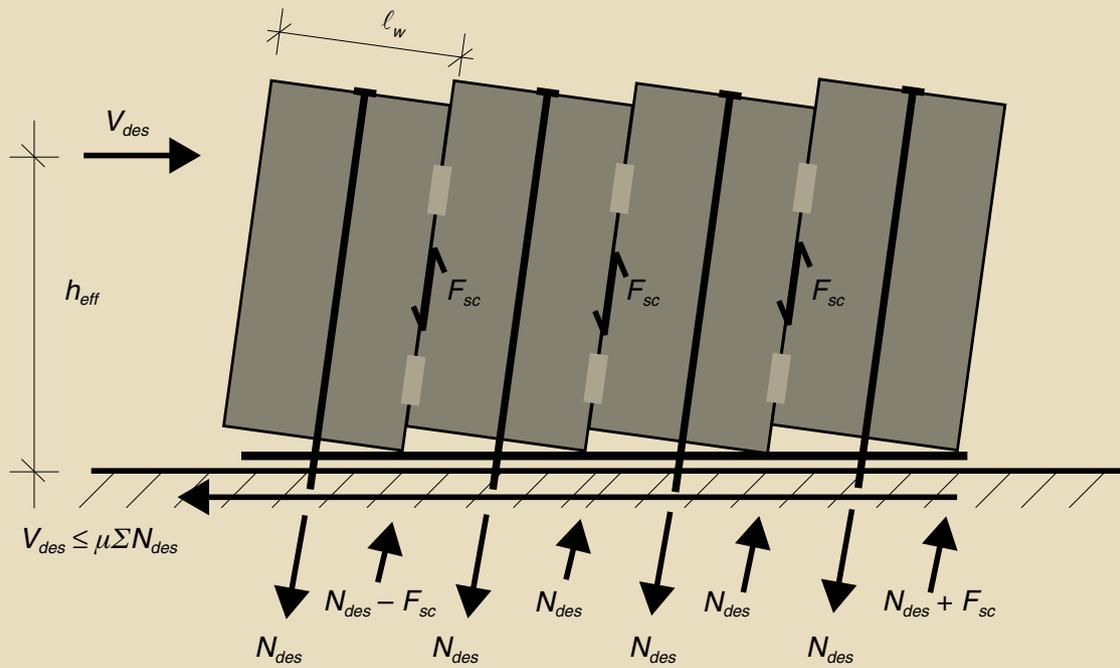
This figure shows the panels and their deformed shapes at design drift. Source: Stanton and Nakaki 2002. Note: F_{sc} = total yield force of all shear connectors in one vertical joint; h_{eff} = height above foundation of lateral load resultant on wall; l_w = horizontal length of one wall panel; N_{des} = total axial force on one wall panel from gravity plus post-tensioning at design drift; V_{des} = design base shear; μ = coefficient of friction against concrete.
